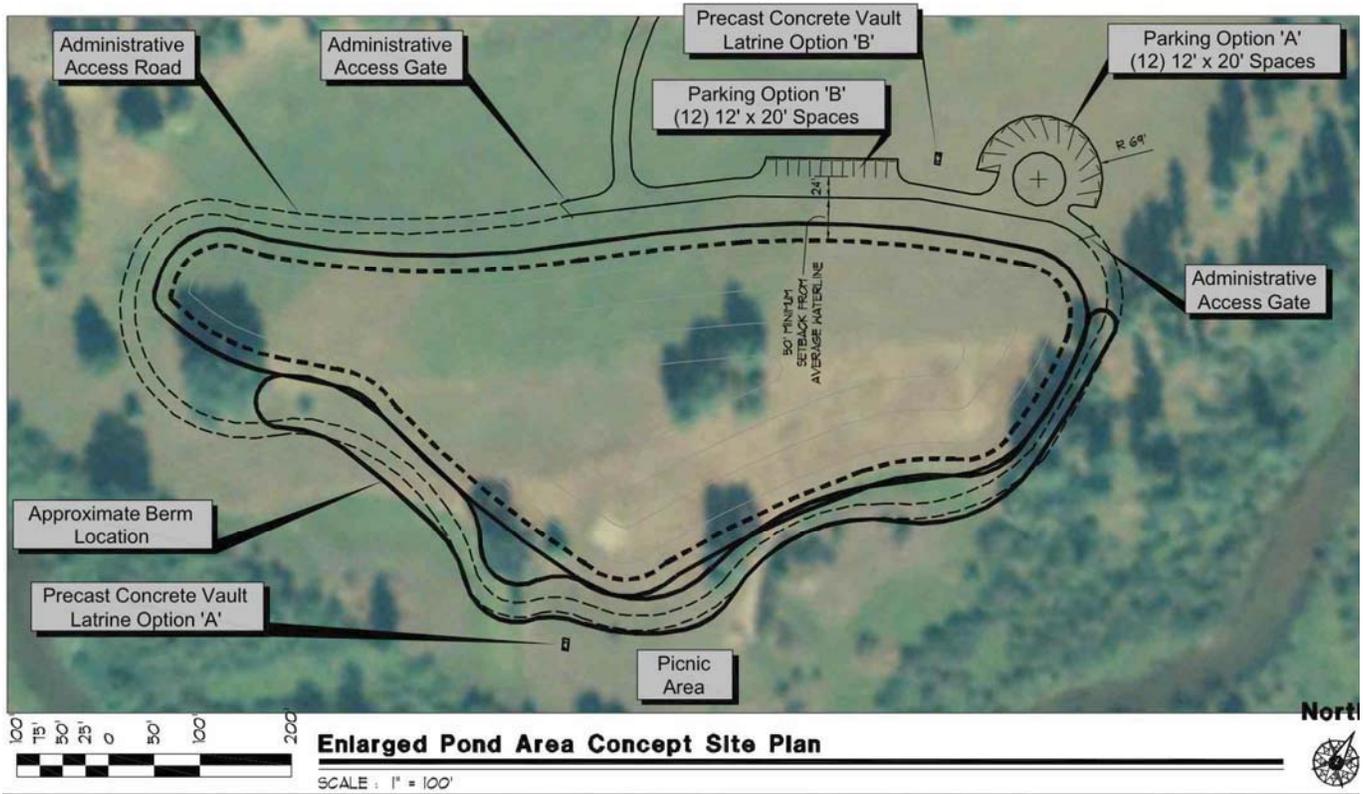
Pine Grove Pond Fishing Access Site Proposed Acquisition Preliminary Concept Plan
